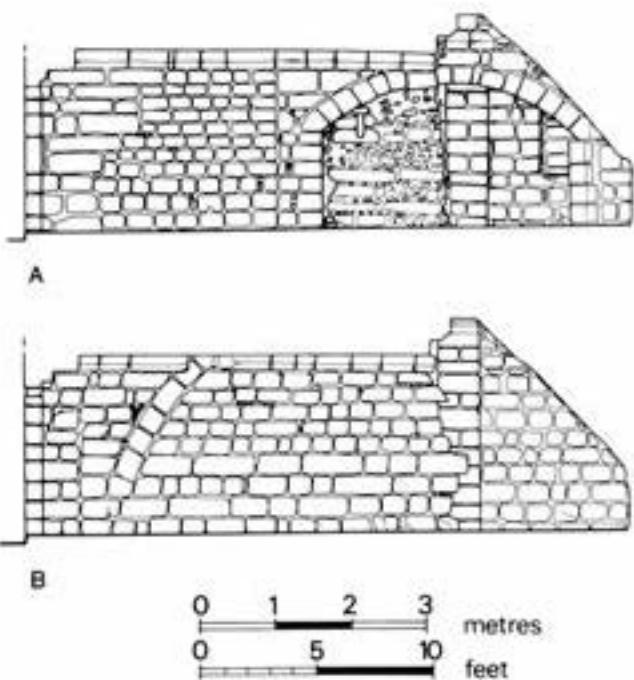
Elevation of the oratory (room 21): A east wall; B west wall
